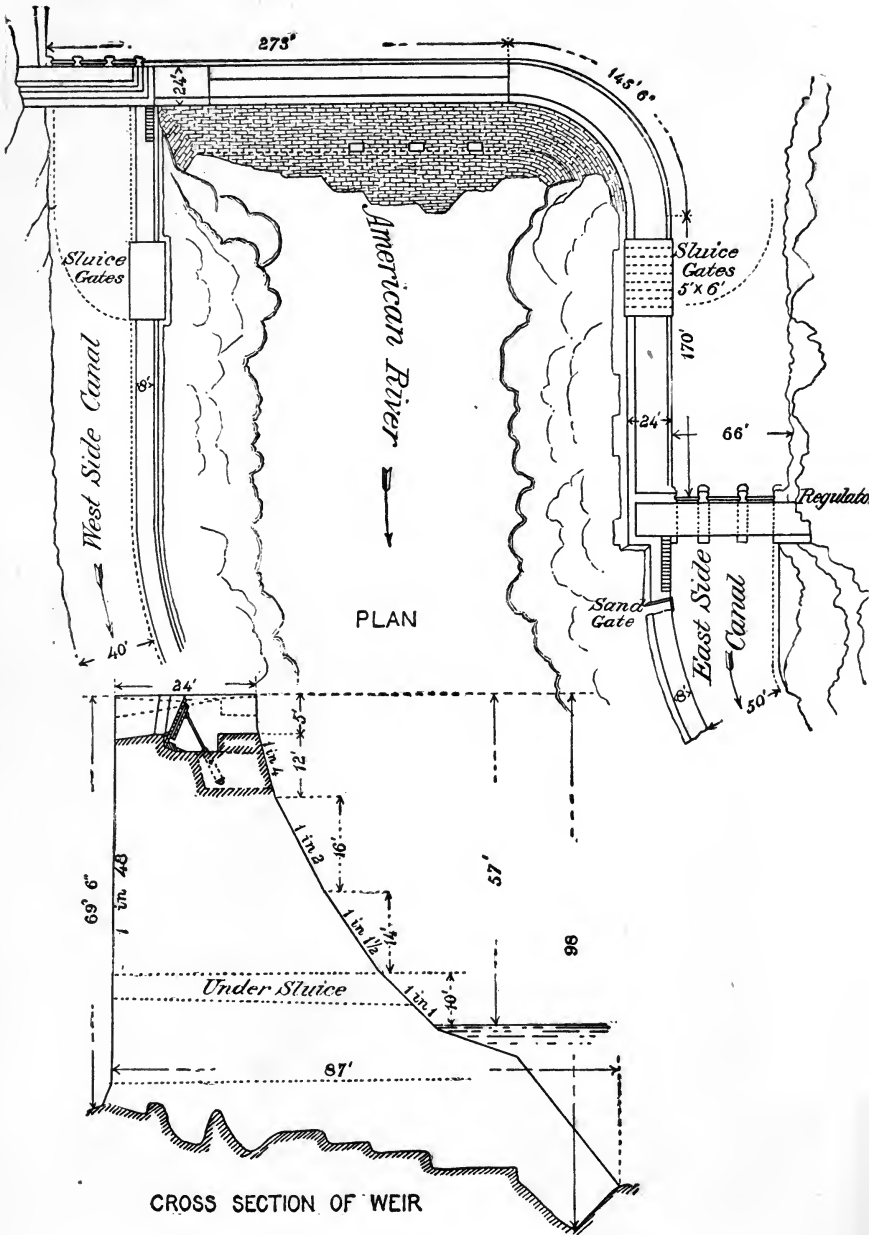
PLATE XXVIII.—FOLSOM CANAL, PLAN AND CROSS-SECTION OF WEIR.
